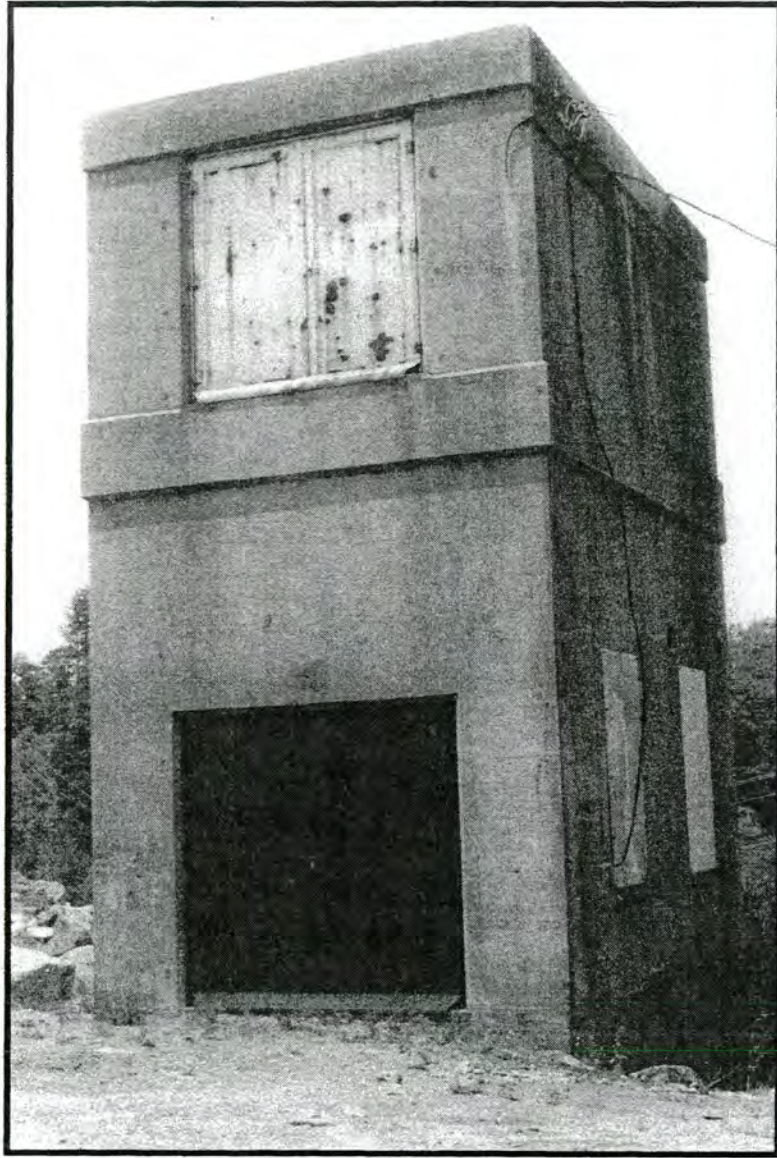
Thorpe Dam diversion gatehouse, south and east facades.
